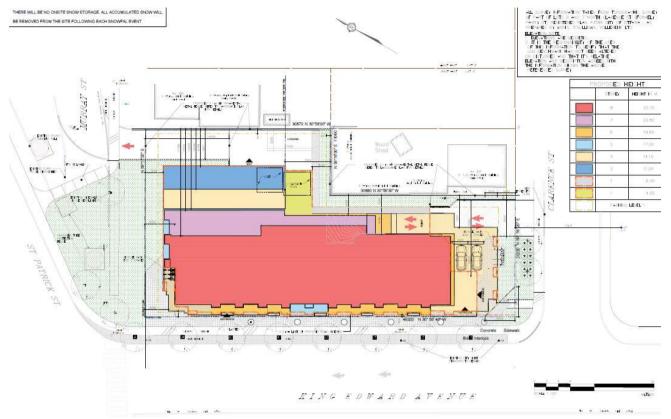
Plan view of the hotel illustrating the stepping back of the 8-floors and the positioning of the building in relation to the neighbouring houses.
